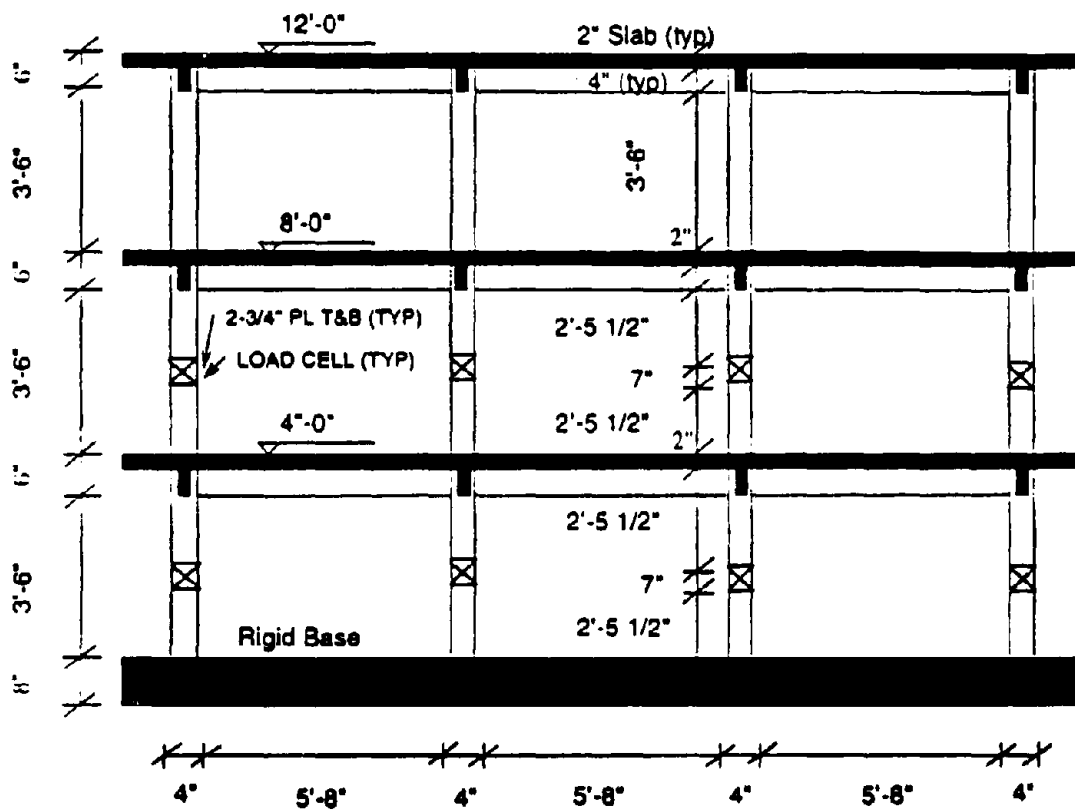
Front Elevation of 1/3 Scale Reinforced Concrete Frame Model
